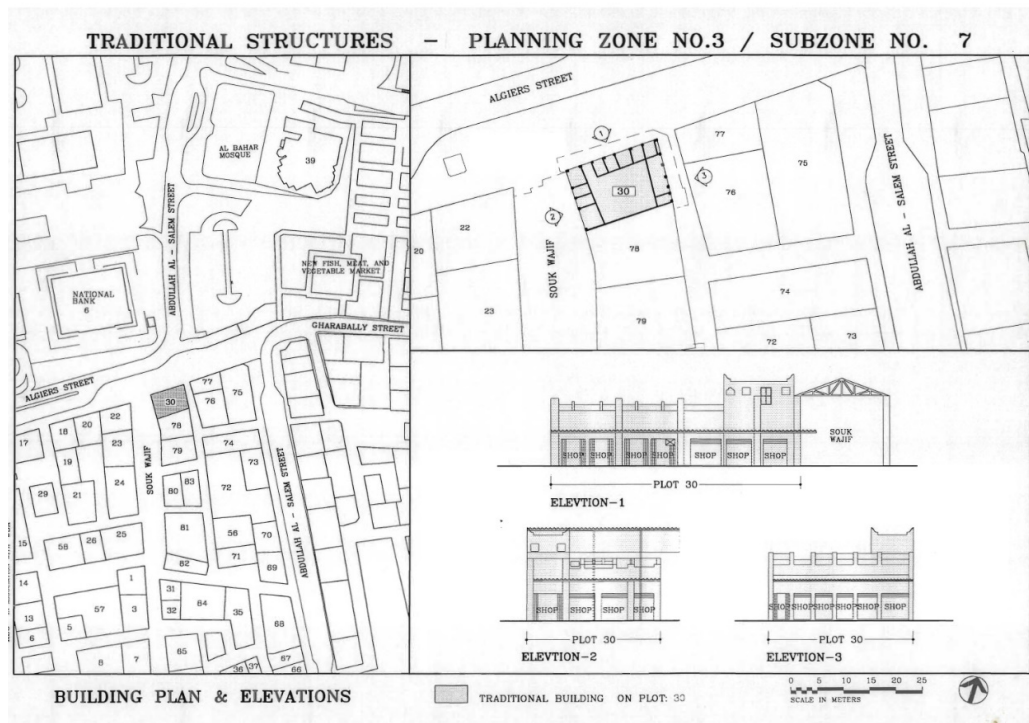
A close-up of Souk Wajif's floor plan and elevation inside Souk Al-Mubarakiya – Kuwait City (Smith, 2005).
